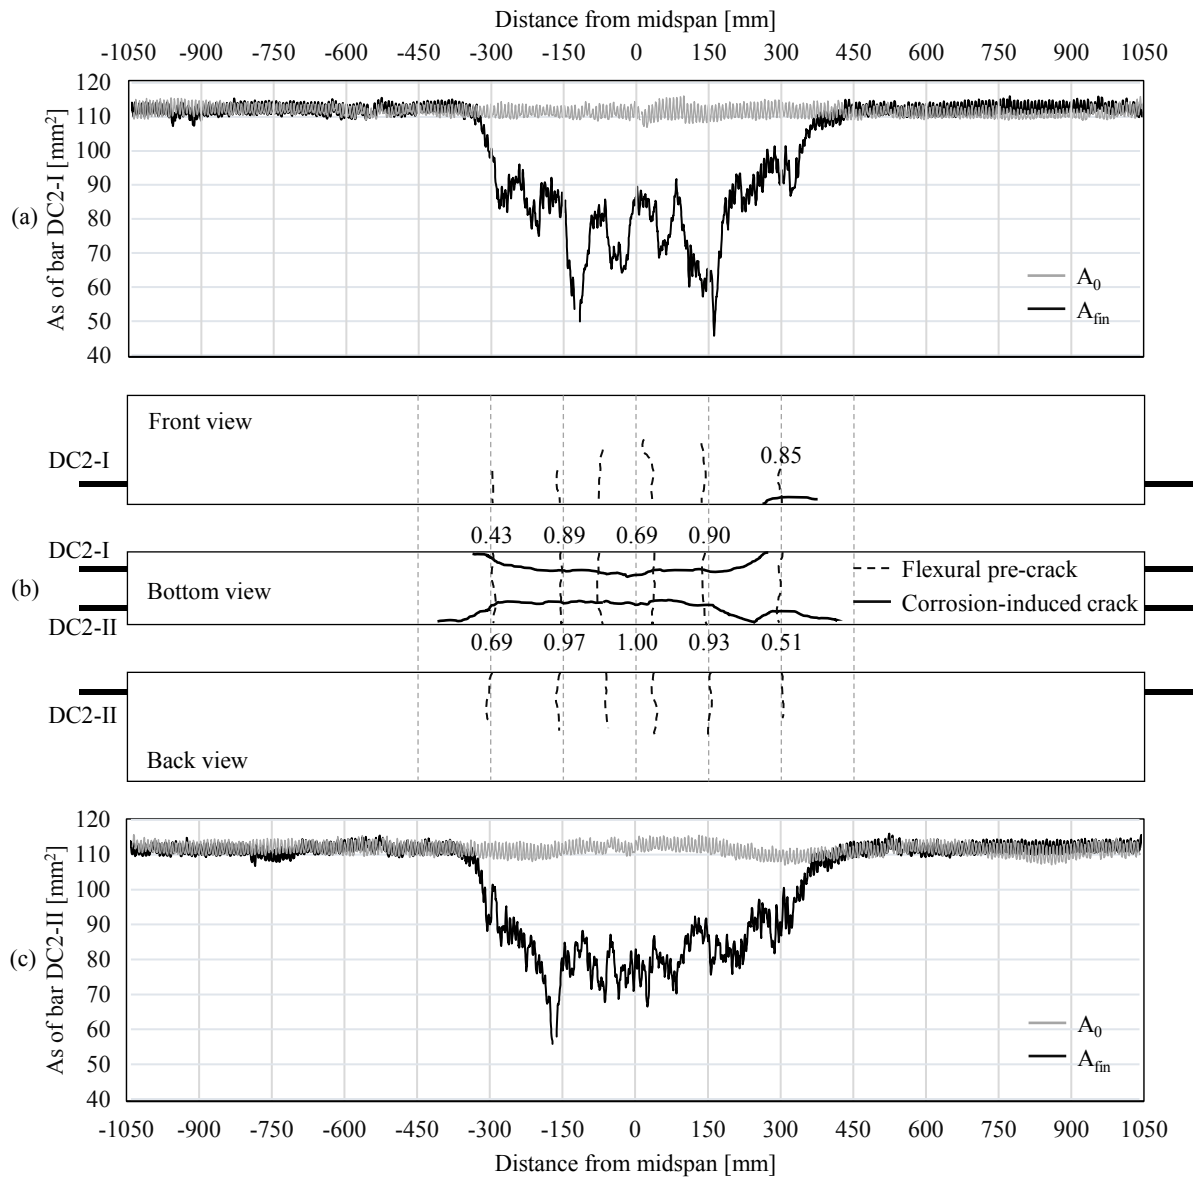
(a, c) Cross-sectional areas of the tensile reinforcement bars I and II in specimen DC2; (b) flexural pre-cracks and corrosion induced cracks, of which the widths (unit in mm) were measured every 150 mm;  $A_s$ —cross-sectional area;  $A_0$ —cross-sectional area of steel bars measured in the initial state before casting beams;  $A_{fin}$ —cross-sectional area of steel bars measured in the final state after taken out from the tested specimens.
